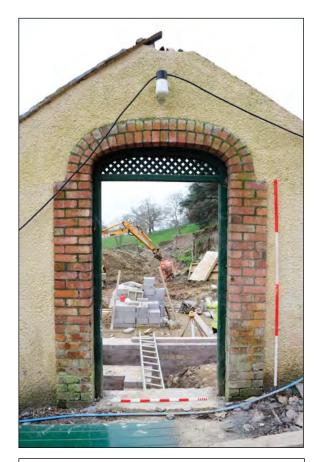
Outbuilding Main Entrance - Would Originally Have Led Directly Into the Walled Garden
